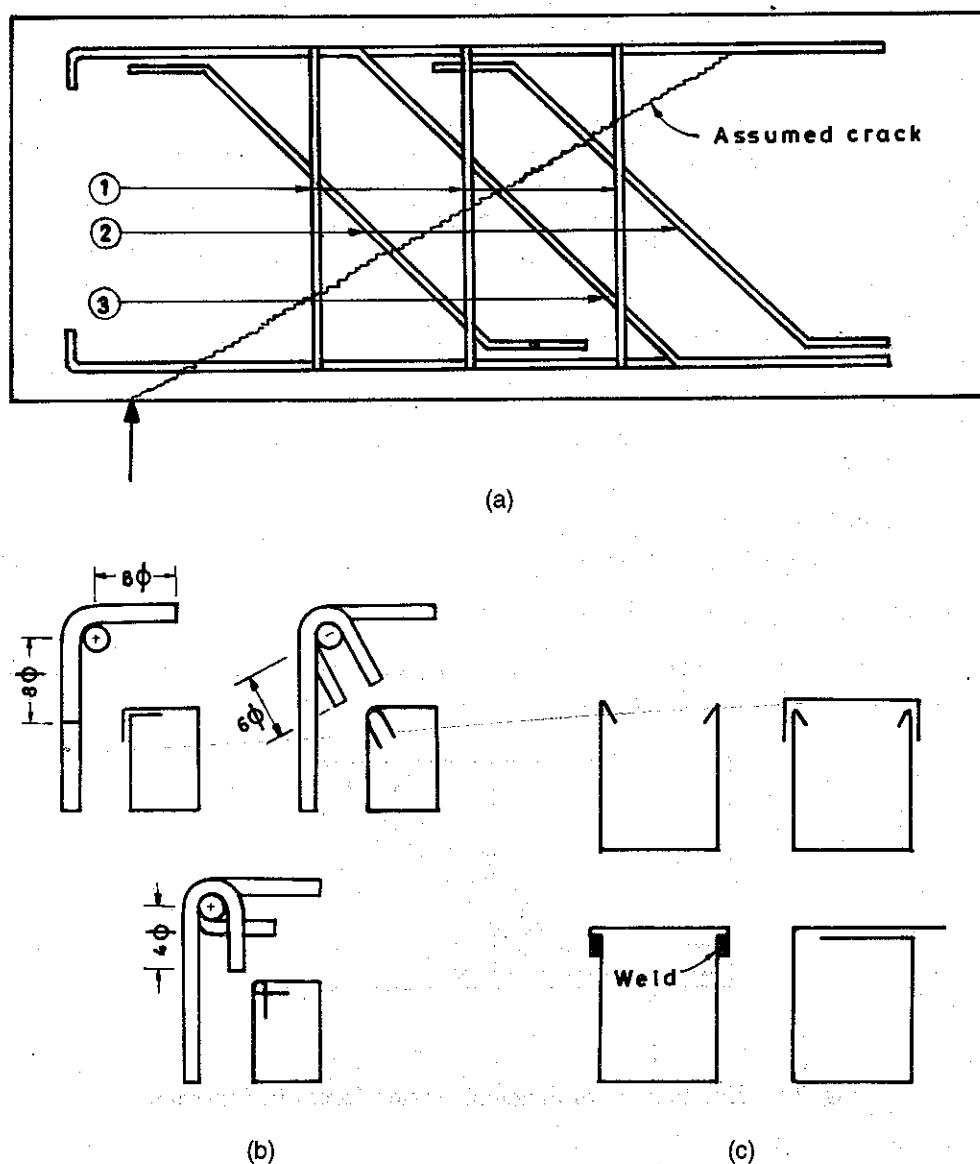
Types of shear reinforcements in beams: (a) Shear reinforcements—(1) System of vertical stirrups; (2) System of inclined stirrups; (3) Bent-up tension bar; (b) Detailing of ends of conventional types of stirrups; (c) Some special shapes of stirrups.
